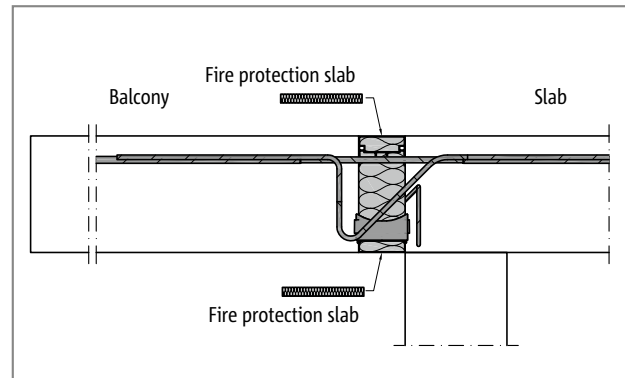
Schöck Isokorb® T type K-E, K-T for R0: retrofitting with fire protection boards
